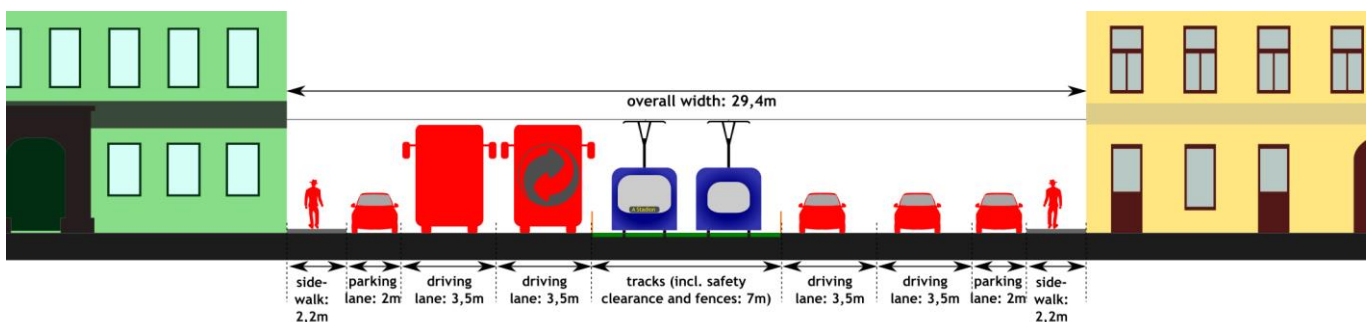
Minimum required street cross-section for a double-track LCRT line, two driving lanes, a parking lane or loading zone and a sidewalk on both sides
